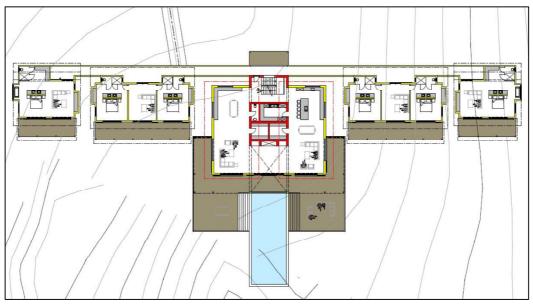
PROPOSED MAIN DWELLING HOUSE
